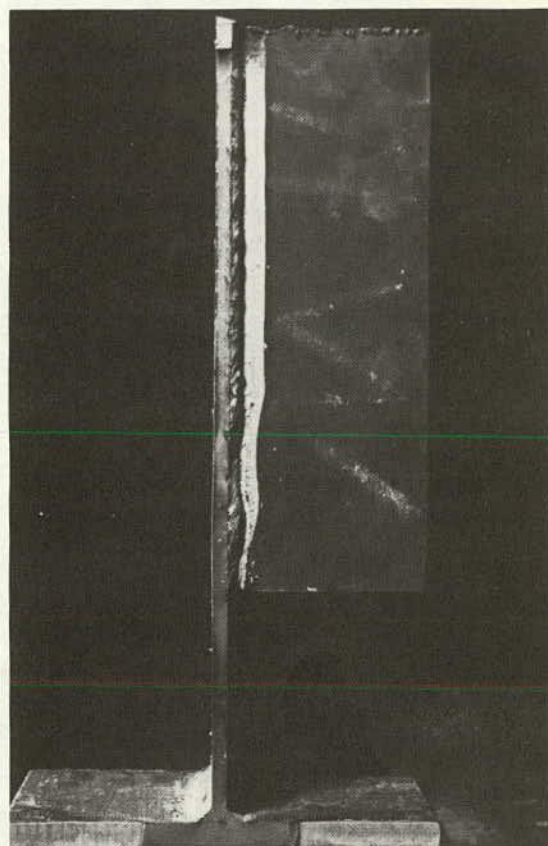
Typical fatigue crack surface at Type 2 stiffener at failure.
